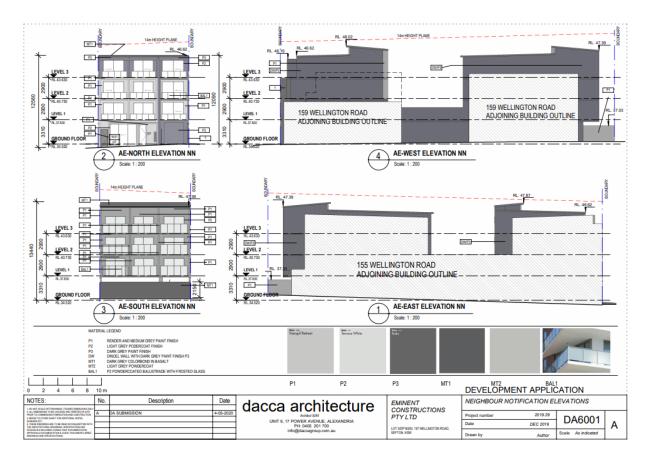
Nearby proposed development (120m to the east) No. 157 Wellington Road, Sefton Source – Dacca architecture (Canterbury Bankstown Council website)
